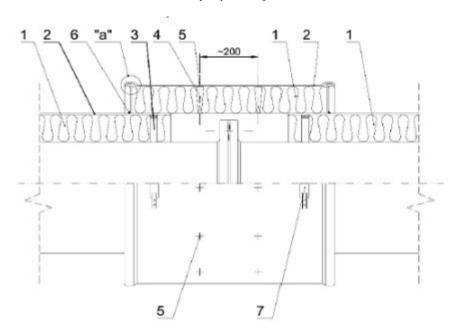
Insulation of flanged joints on horizontal pipelines. 1 - Insulation mat, 2 - Insulation jacket, 3 - Supporting structure, 4 - Insulation fastener, 5 - Tube rivet with fastening core.
